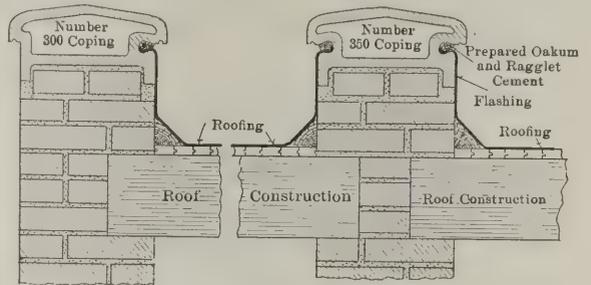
Section Through Roof Construction and Parapet Wall Showing use of Combined Raggle Blocks
